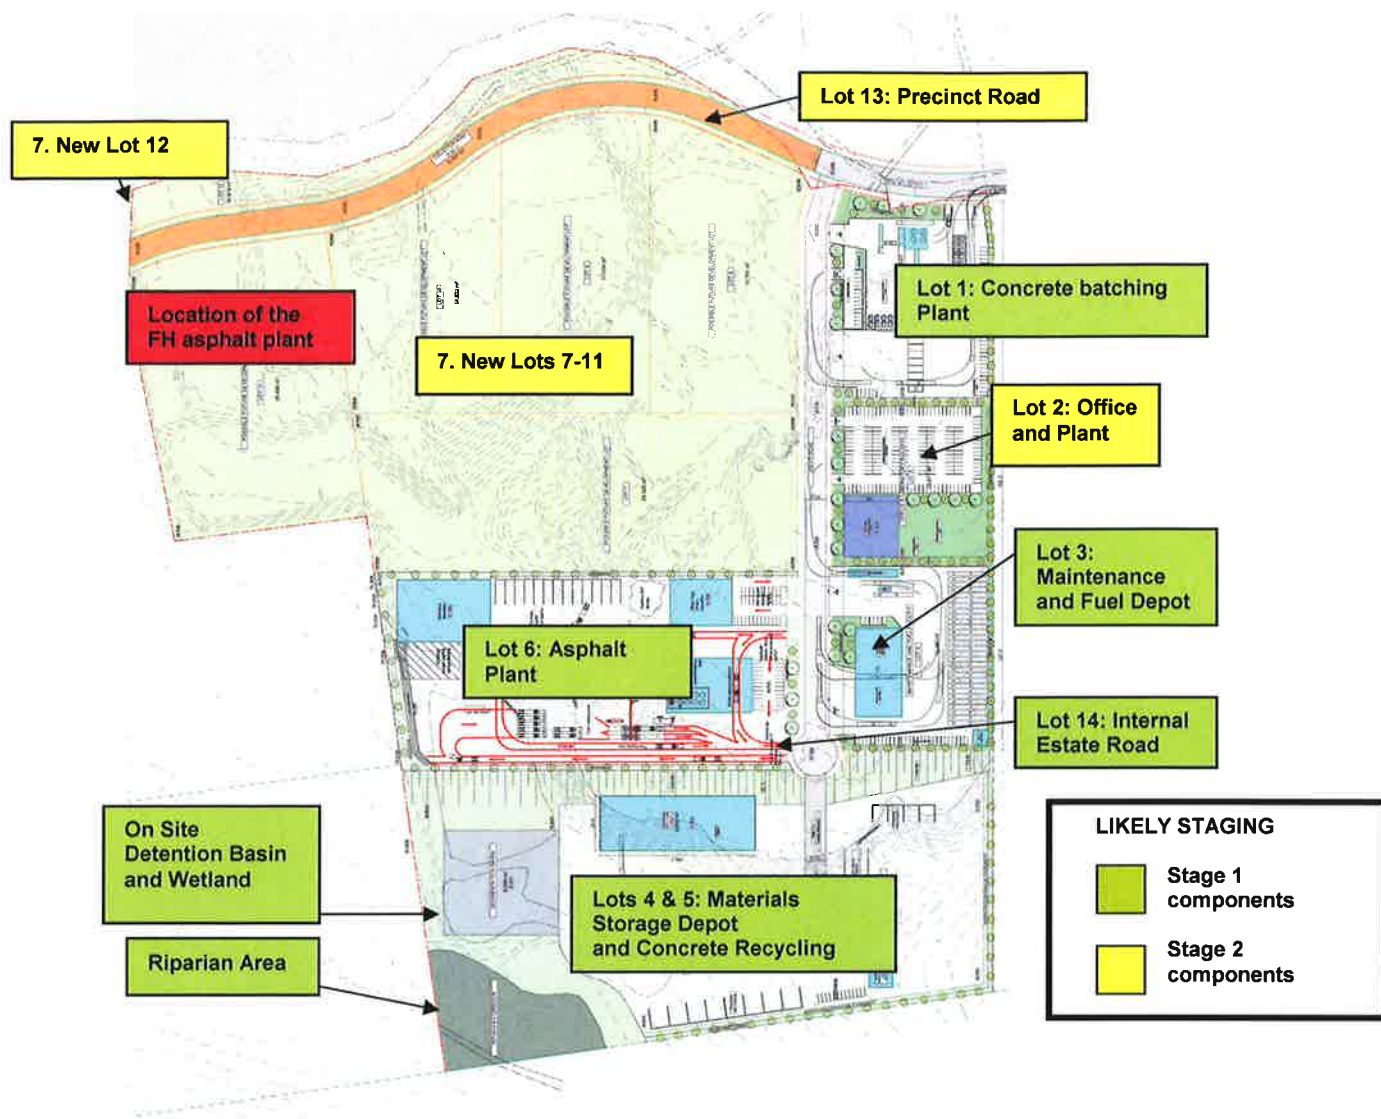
Approved Concept Plan layout and location of the FH asphalt plant
